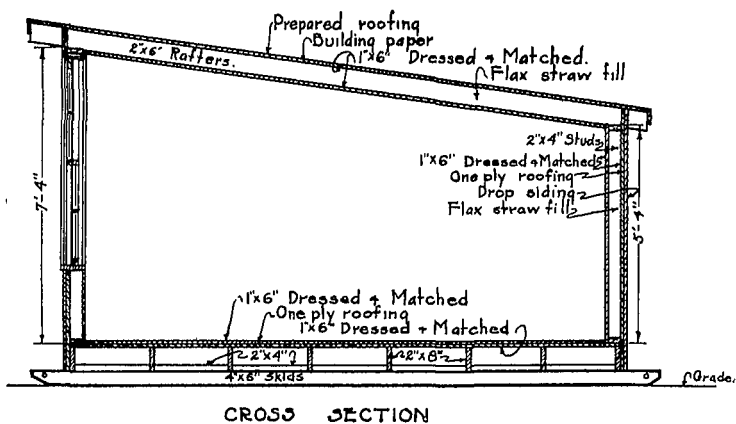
Side view showing method of construction and arrangement of skids under the building.
